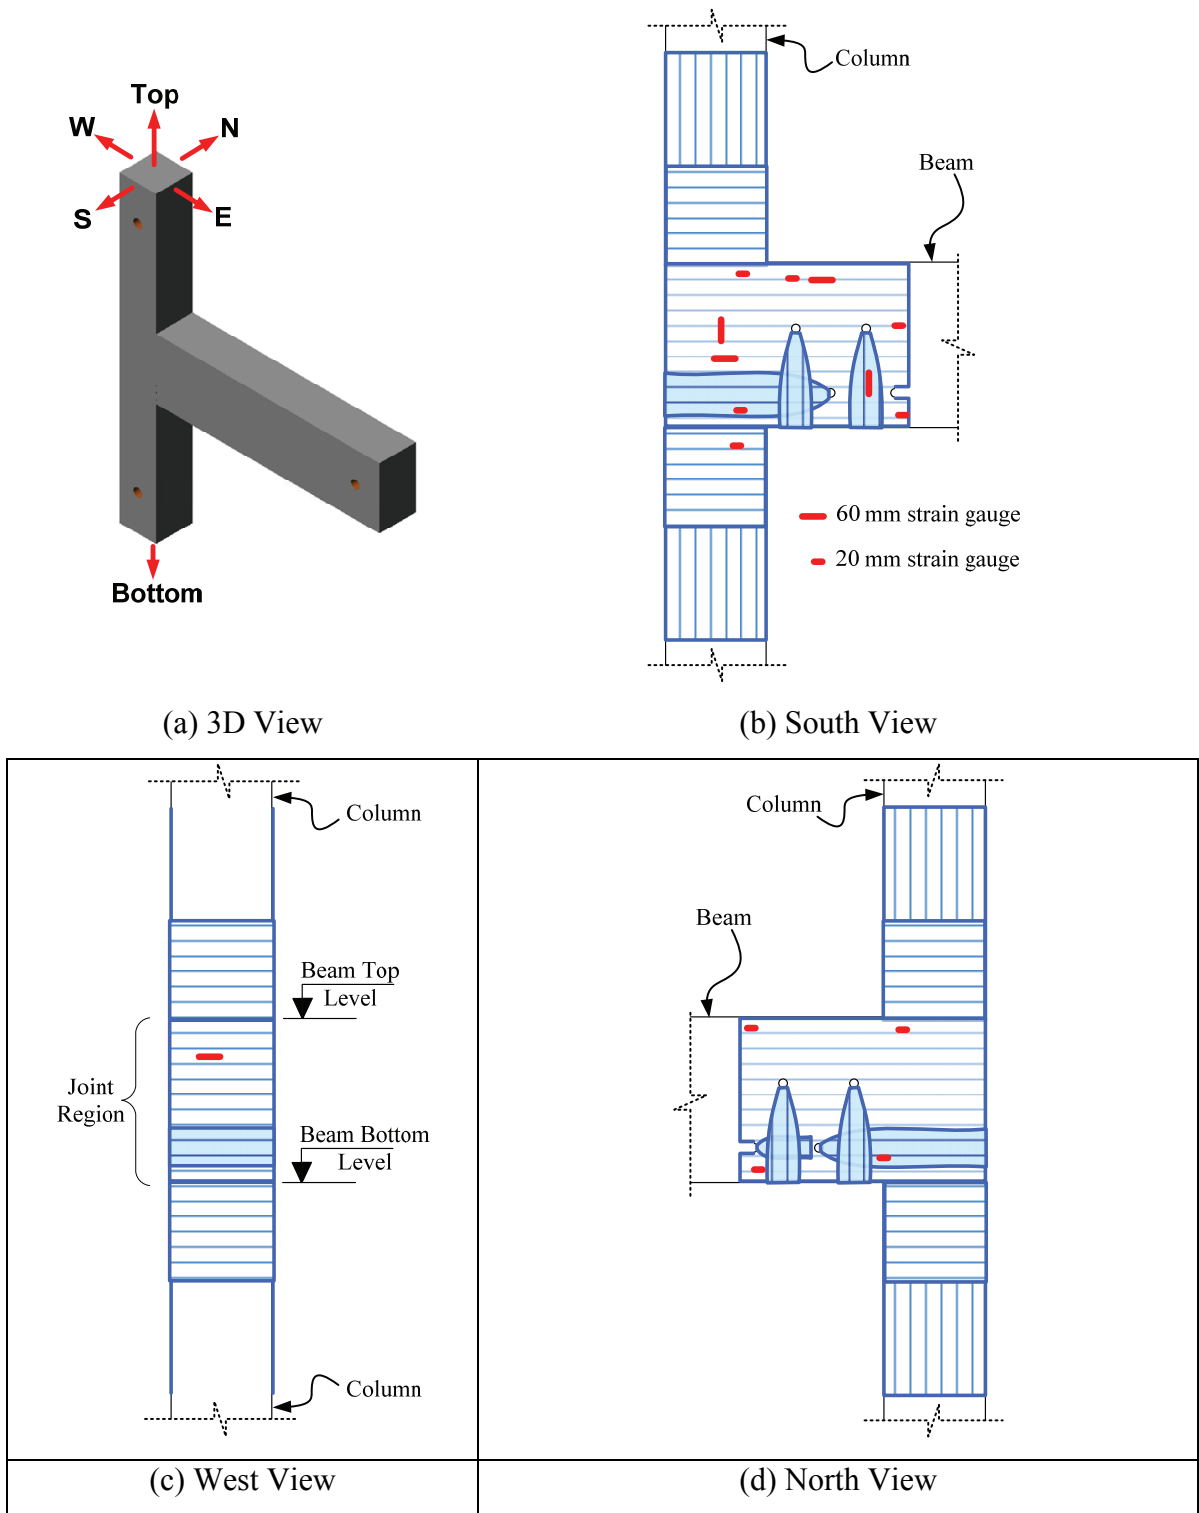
Typical strain gauge placement for CFRP sheet reinforcement
